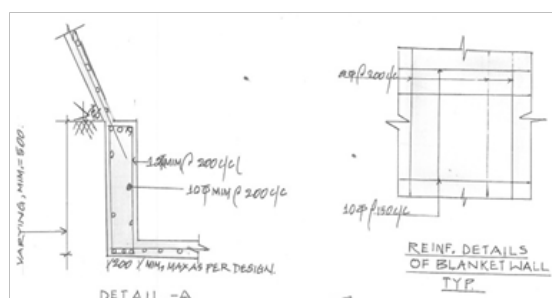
Reinforcement details of gravity beam & Blanket wall
